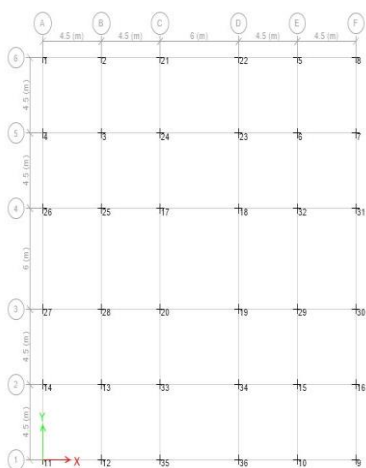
Grid Lines of Soil Structure Interaction Joints of Frame in Plan
